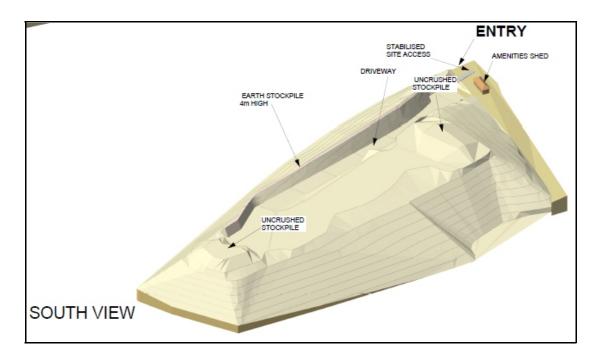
Extract from the 3D model of the Site Preparation Stage of the proposed development. Full details are provided on Drawing No.08, Issue D of the plans of the proposed development at Appendix 9.
